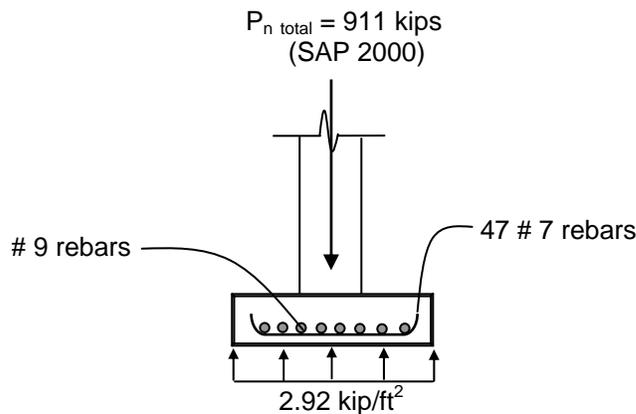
Section B of column footing: Applied load and soil reaction.
